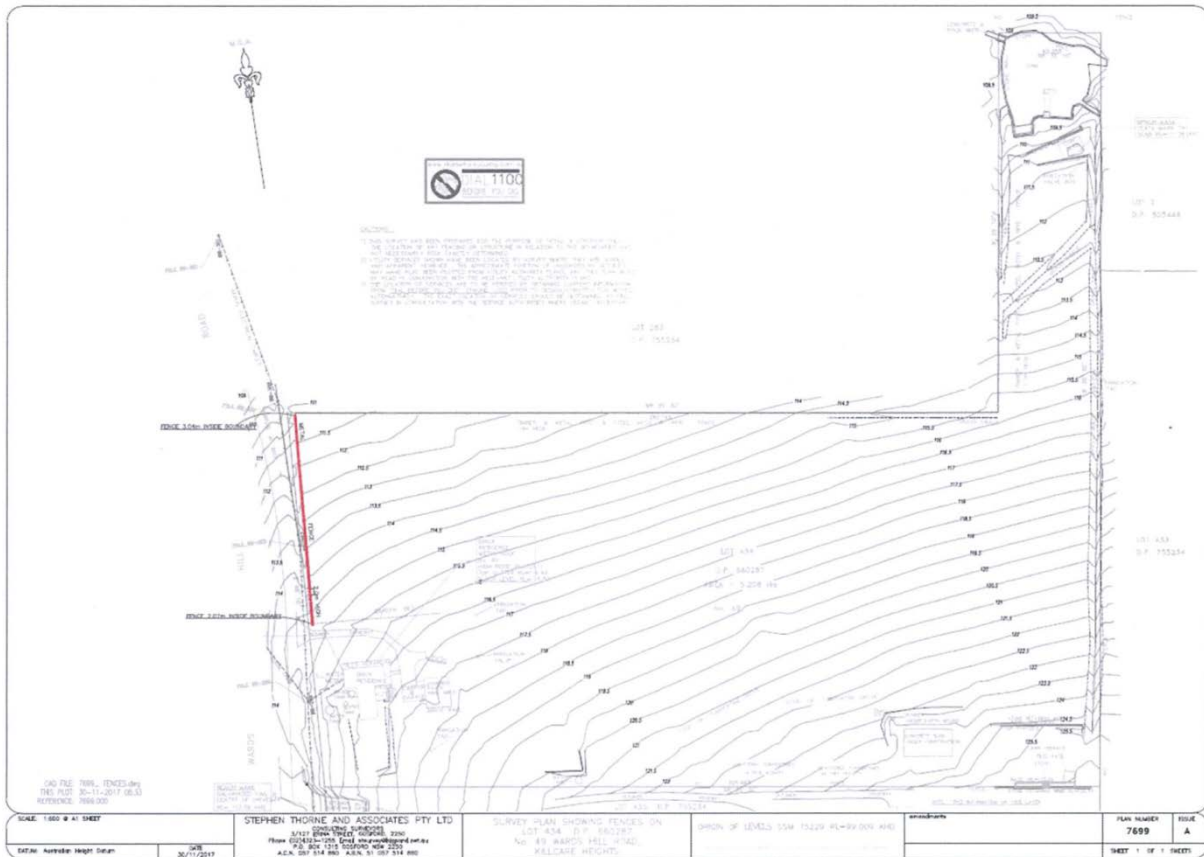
Survey plan. Location of fence which is the subject of the Building Information Certificate application shown in red.
